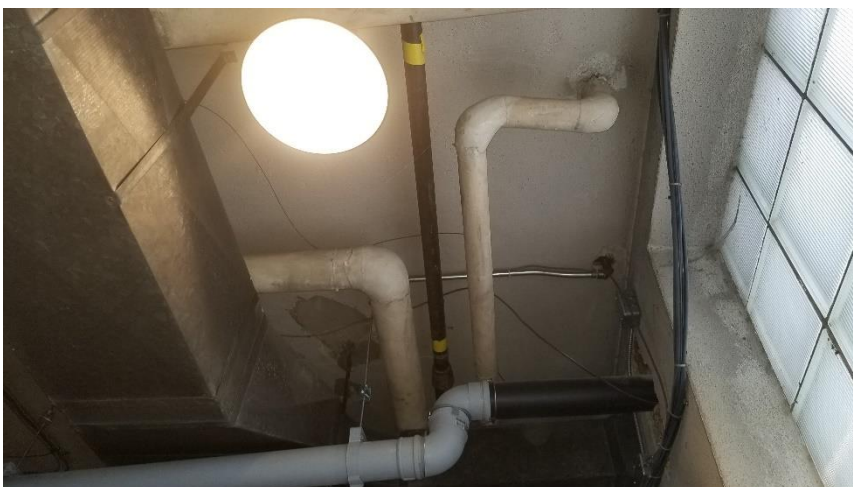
Representative view of the asbestos-containing parging cement elbows observed in good condition in the Furnace Room 011.
